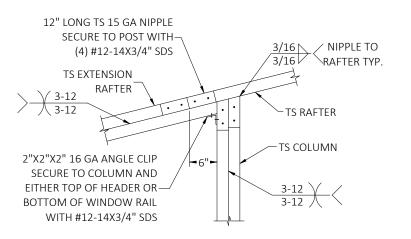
A SIDE EXTENSION RAFTER/COLUMN CONNECTION FOR RAFTER SPANS LESS THAN 12'-0"
